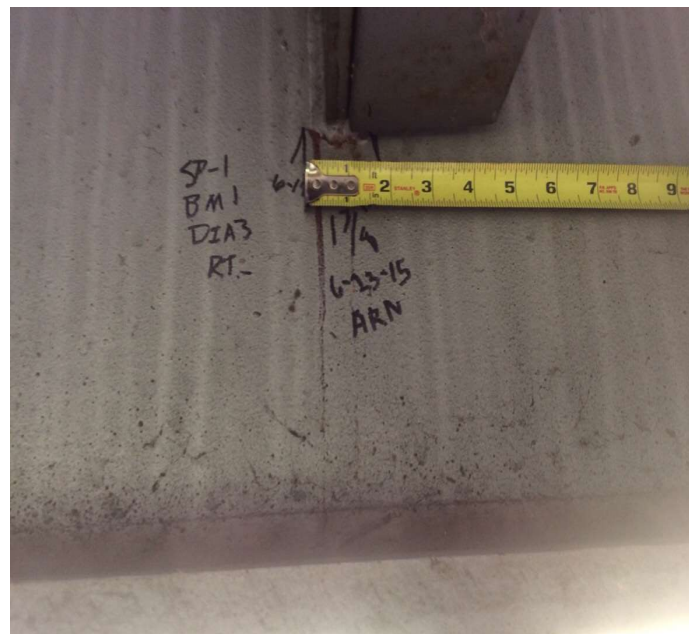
Description Span 1 beam 1 diaphragm 3 has 1 5/8 inch crack in the web
